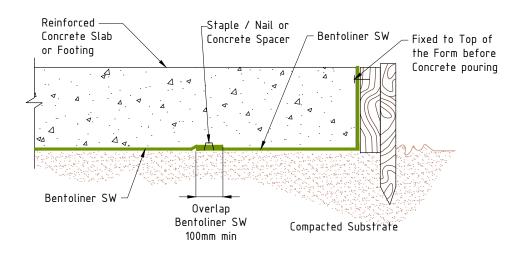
BentoLiner® SW turned up and secured at top of concrete form
